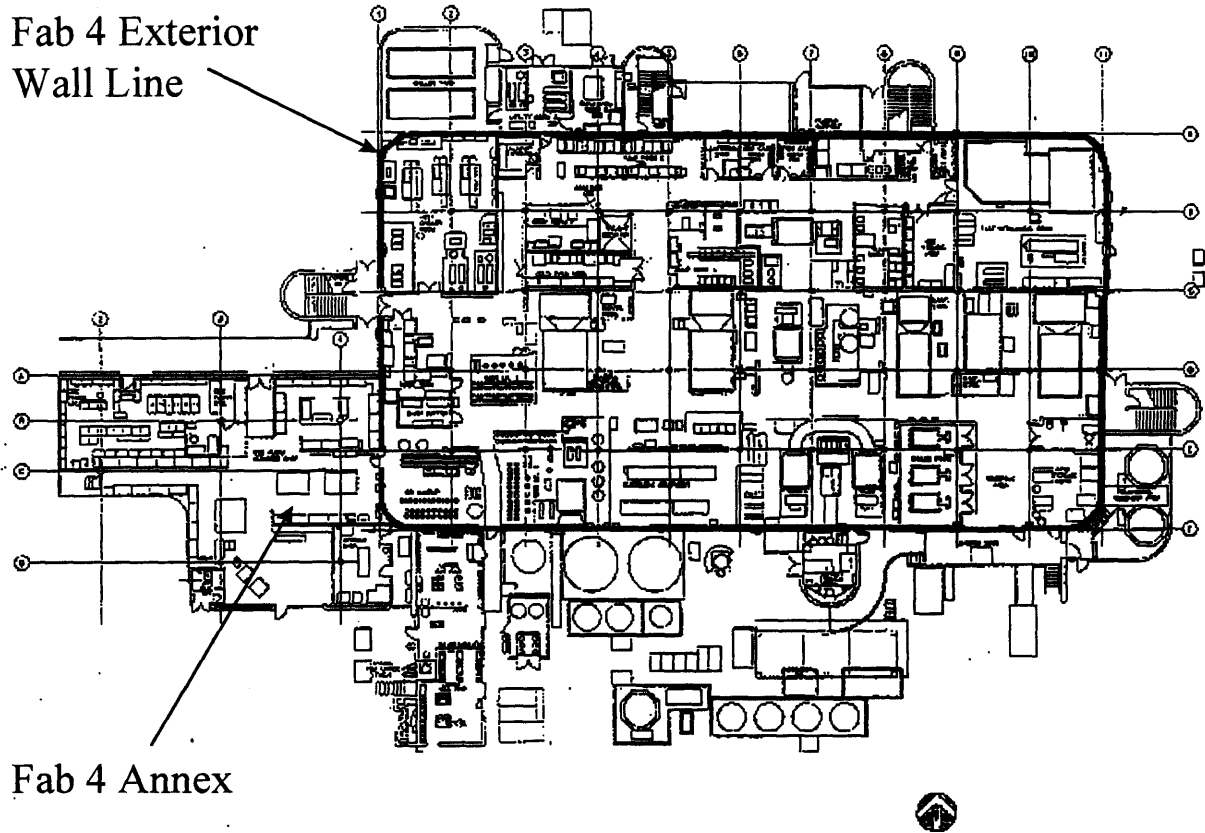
Fab 4 - First Floor (Subfab) Area Layout, June 1996
